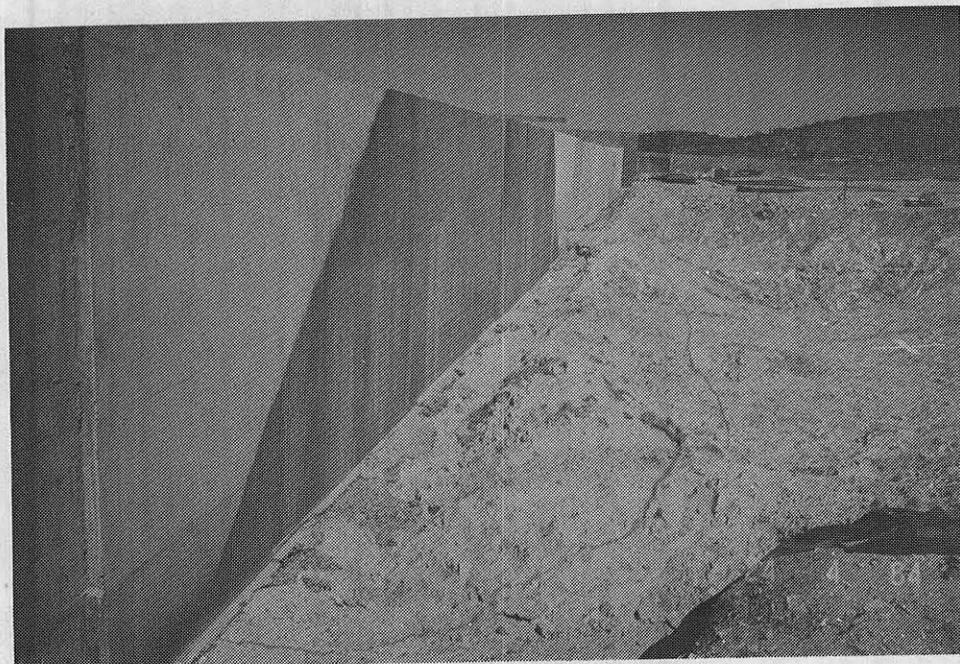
Outline of concrete plug (fillet) area marked on the east side of outlet. Note most of conduit projects above adjacent foundation surface due to greater depth of core trench excavation. April 1984
